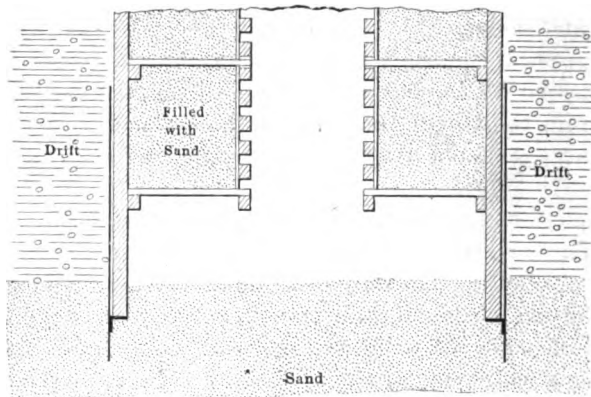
METHOD EMPLOYED IN SINKING AIR SHAFT.
